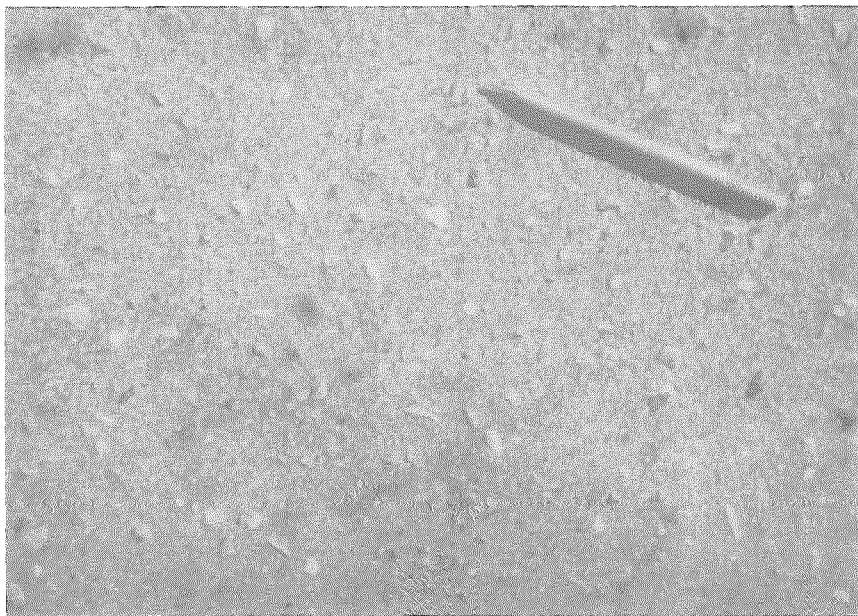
Stone-filled sand-asphalt surface, 4 years after construction.
